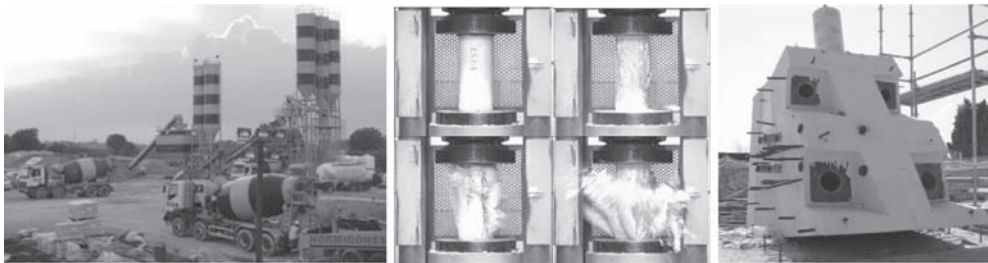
Site concrete production facility (left), site testing (center) and real scale model (right).
